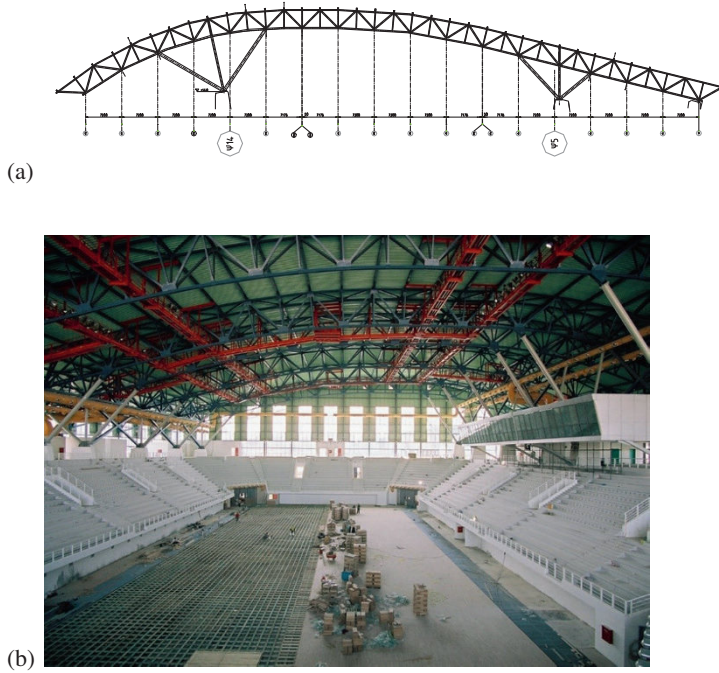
Typical frame (a) of a swimming pool building (b)
